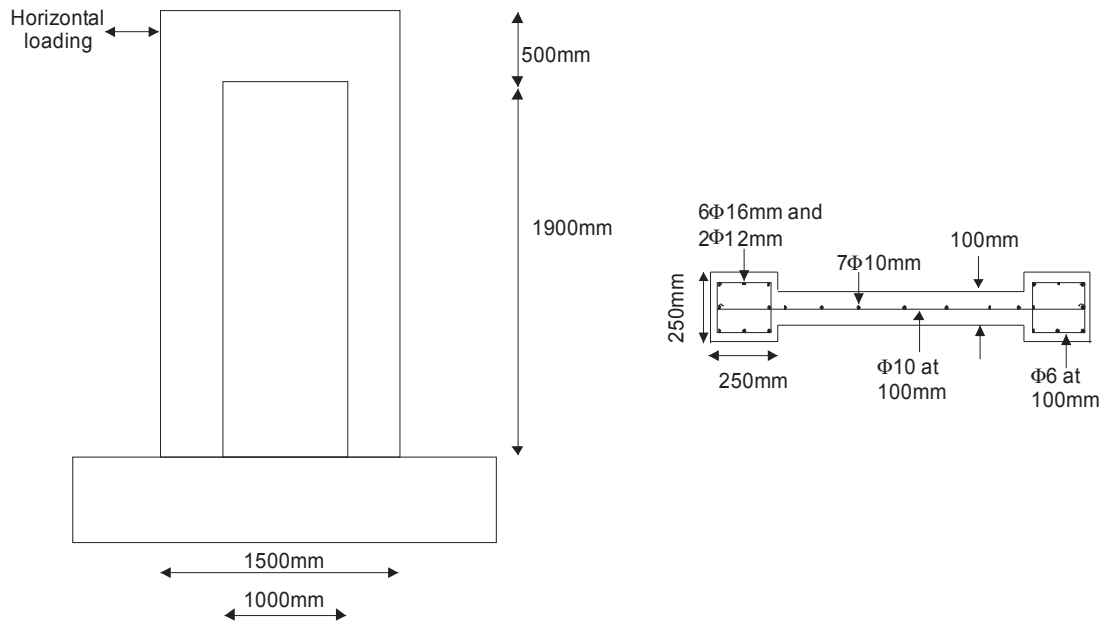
Geometry and reinforcing details for Sittipunt et al. (2001) wall W2
